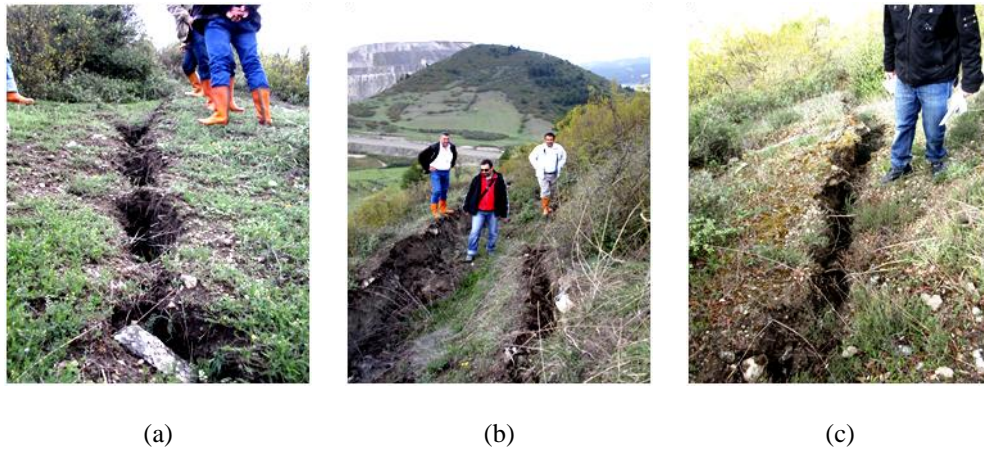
Observed tension cracks at the top of the hill near the open pit mine
